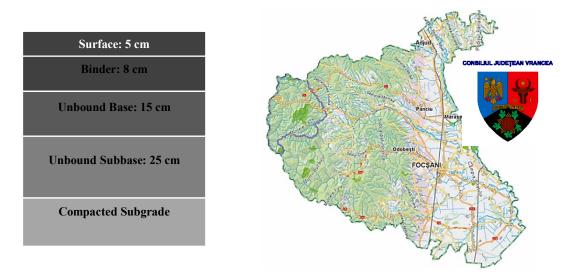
The Vrancea County Council road network: basic pavement structure
